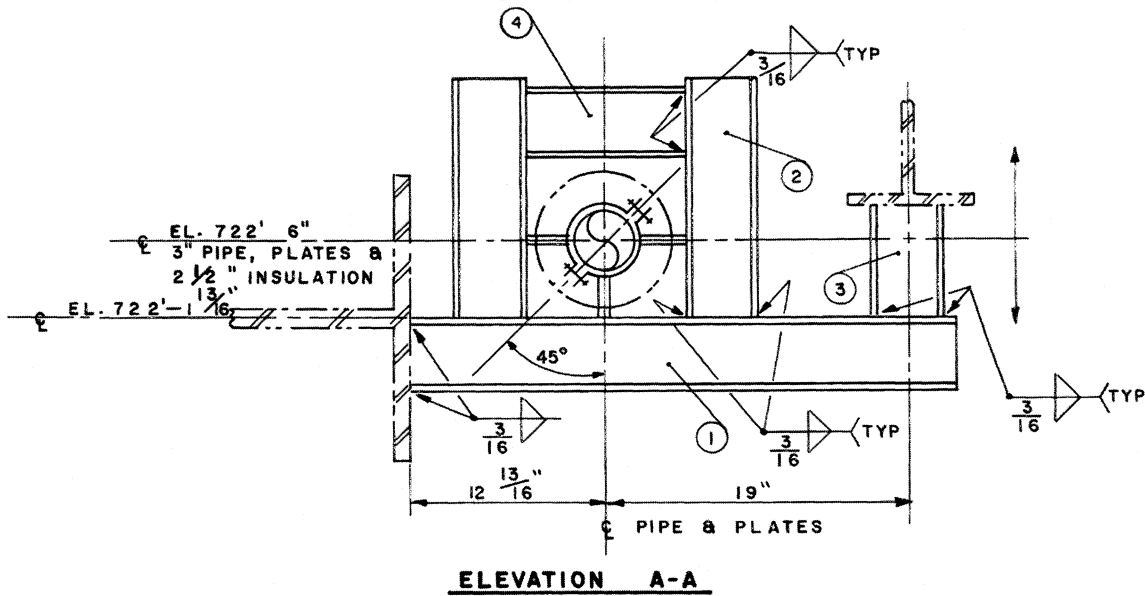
Welded Pipe Support Using Structural Steel
